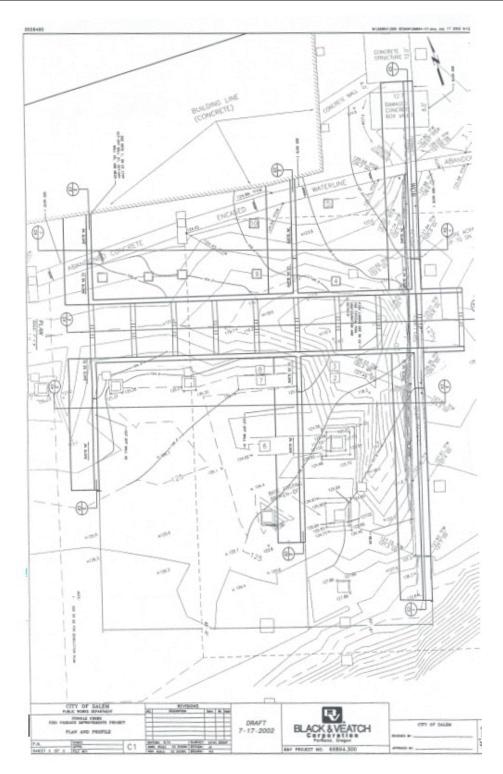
Design plans for the Pringle Creek Commercial Street weir and fish ladder.
